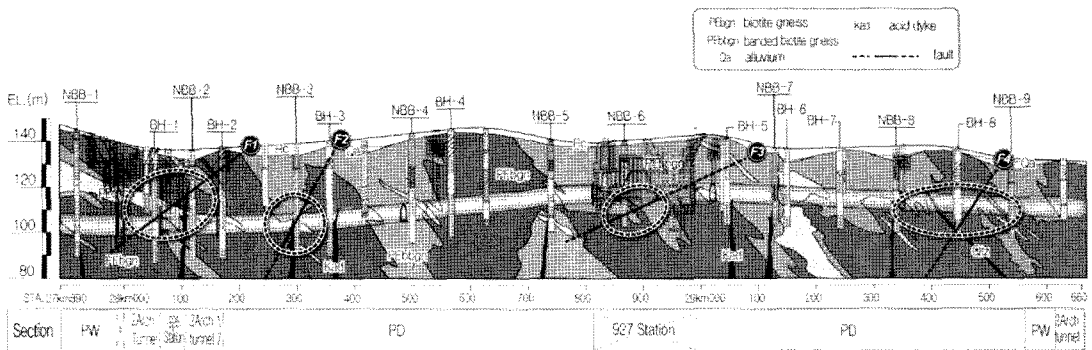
Geology and tunnel longitudinal section (PD: double lane track section, PW: enlarged section).
